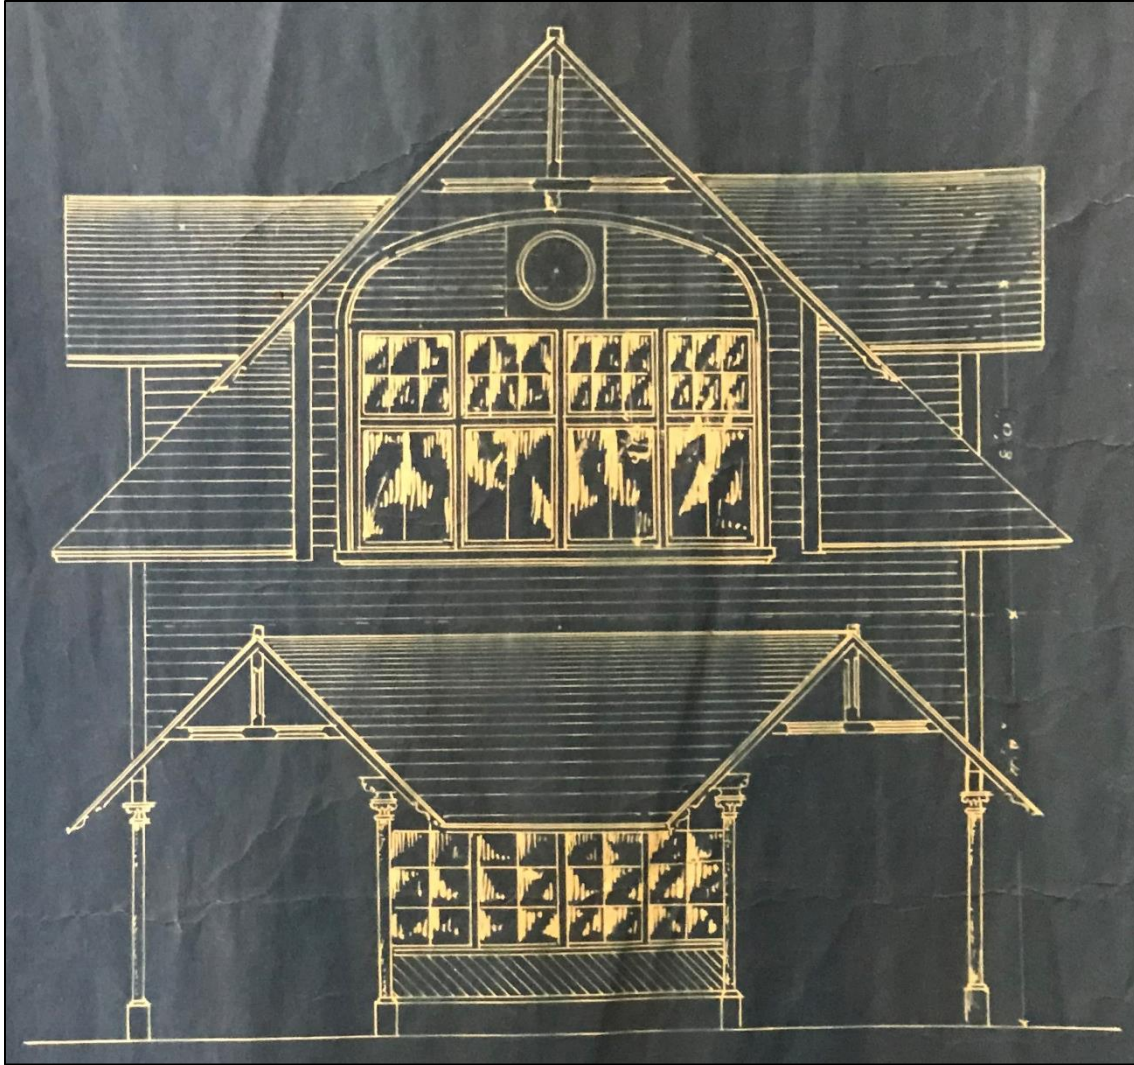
Detail of the Front Elevation from the 1913 architectural drawings of the proposed Ferry Building. Note the inclusion of the gable brackets in these original plans. (Source: West Vancouver Archives, 0596-02.01)
